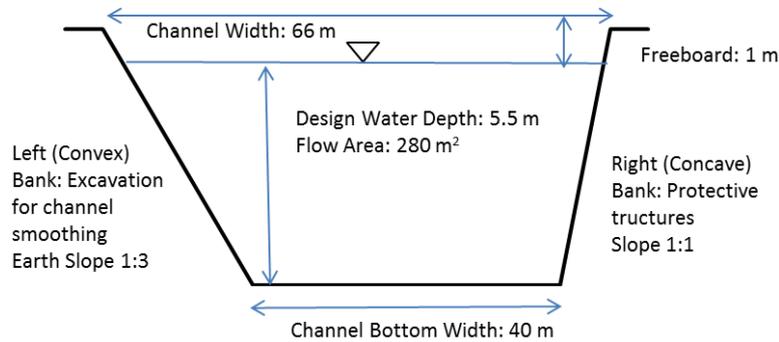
Typical Design Cross-section along the Bend around Teouma Bridge
